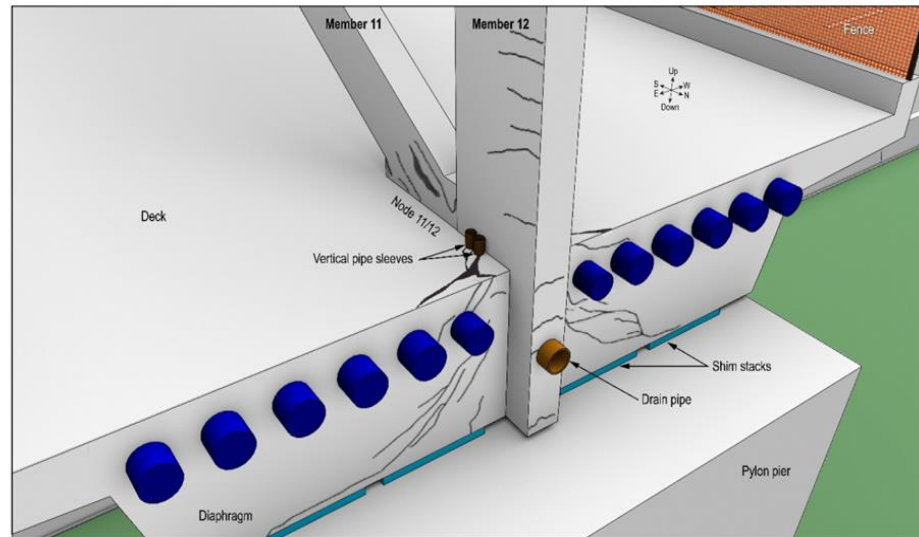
South and east view of extent of cracking at member 11/12 nodal region, deck, and diaphragm, indicating structural distress.
